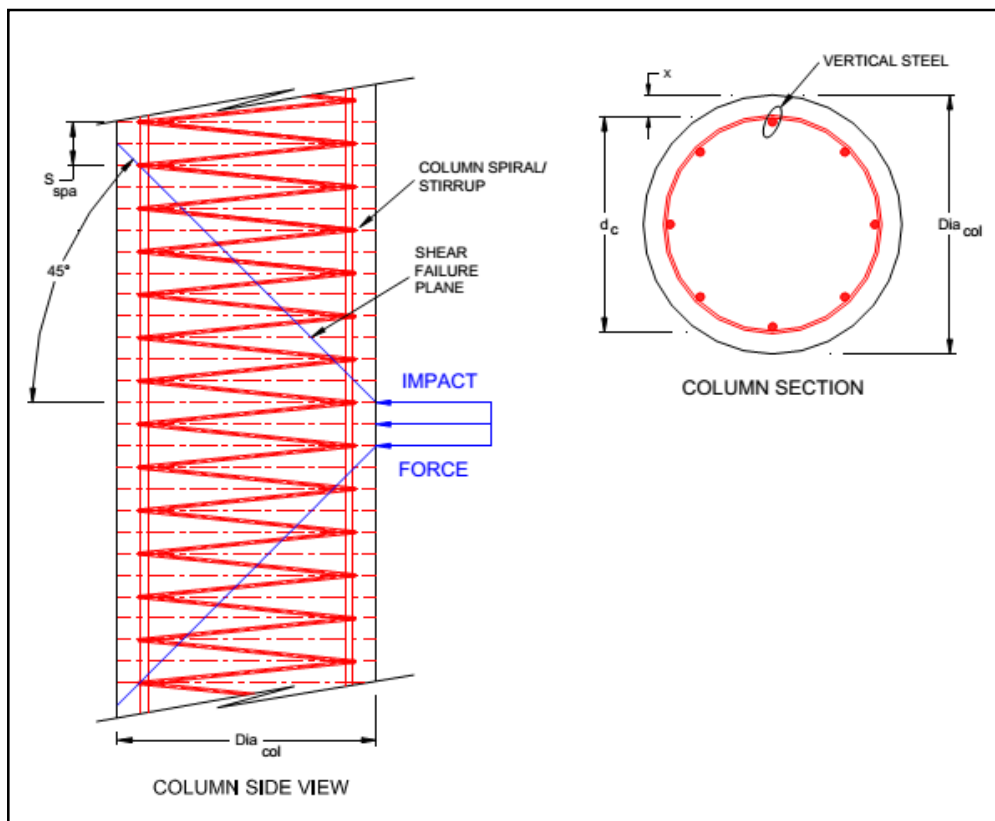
Failure Mechanism from Impact Force on Pier
